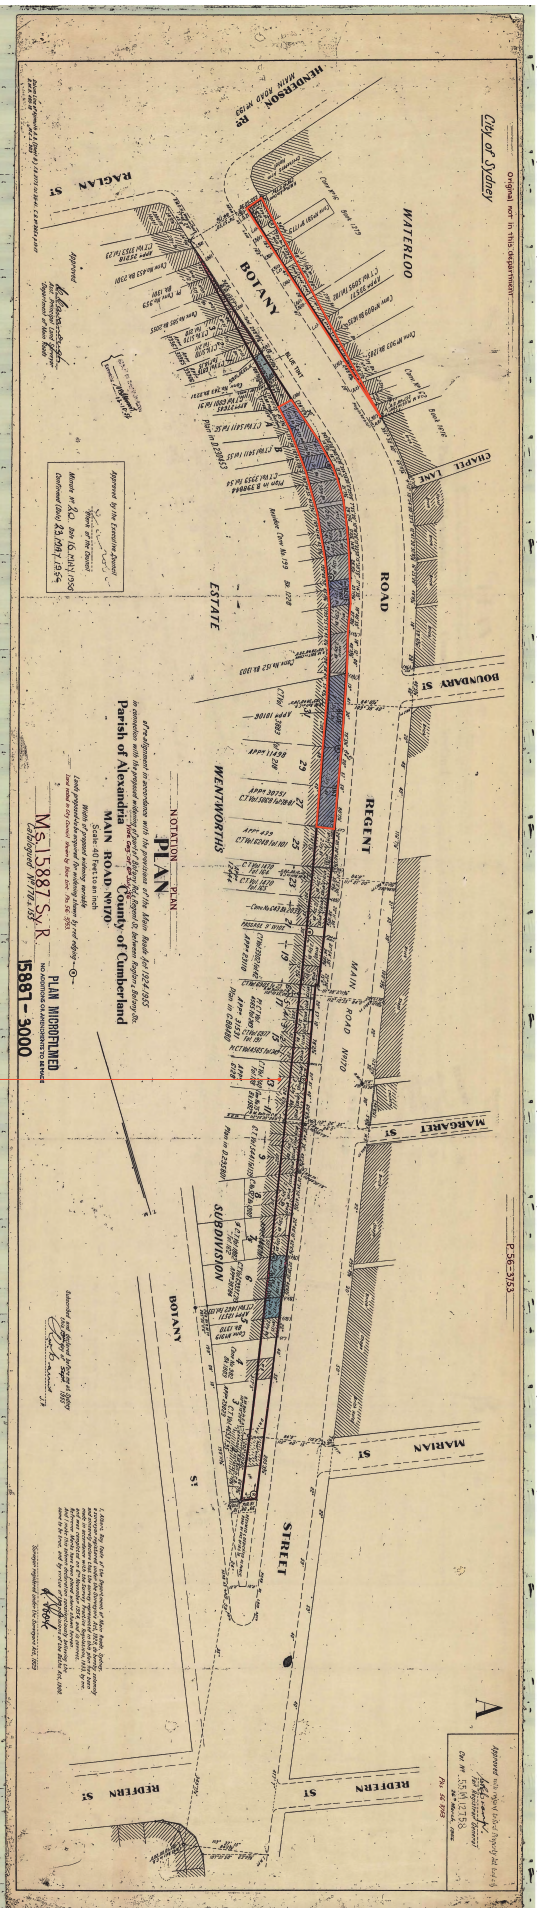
1956 Crown Plan 15887-3000 showing proposed Botany Road widening.
